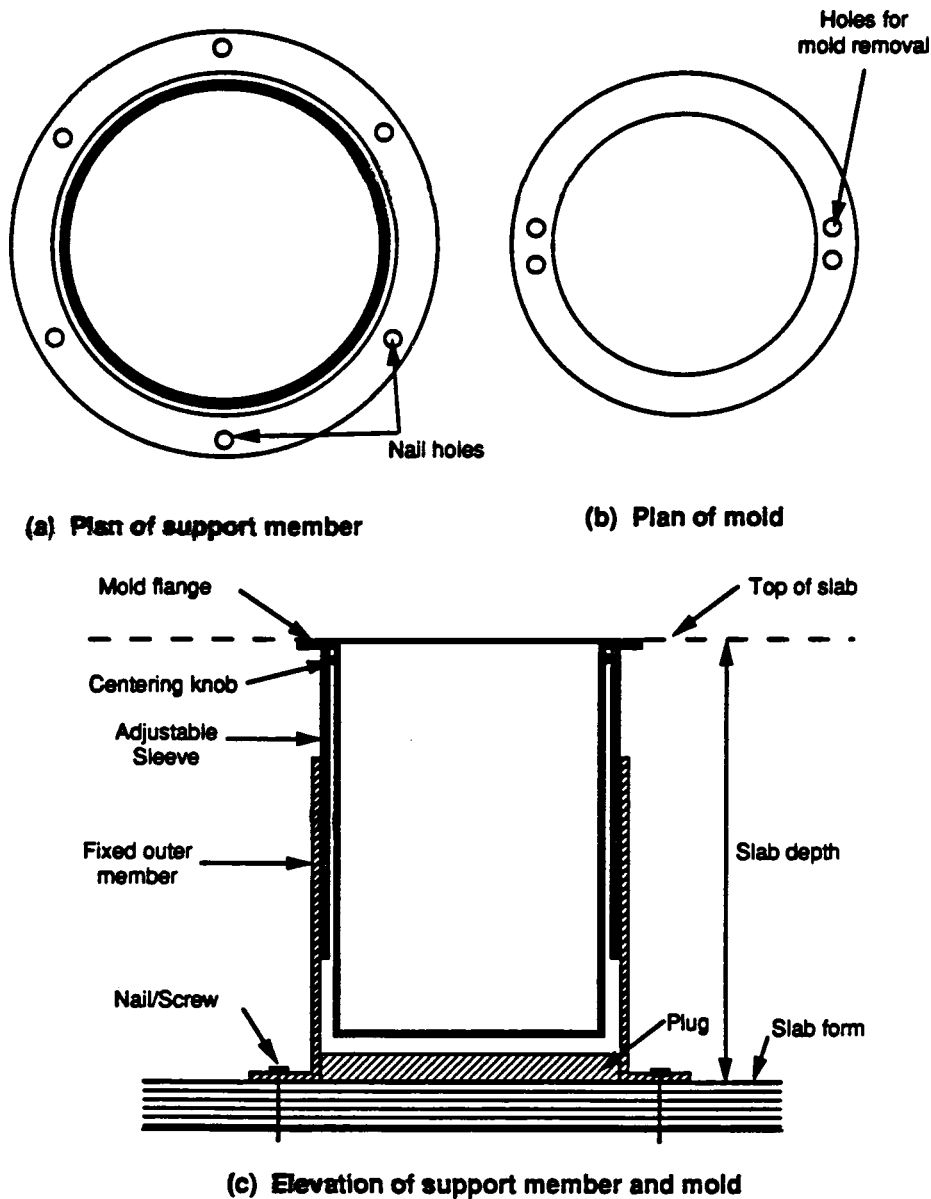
Schematic of Cast-in-Place Cylinder Mold Assembly
